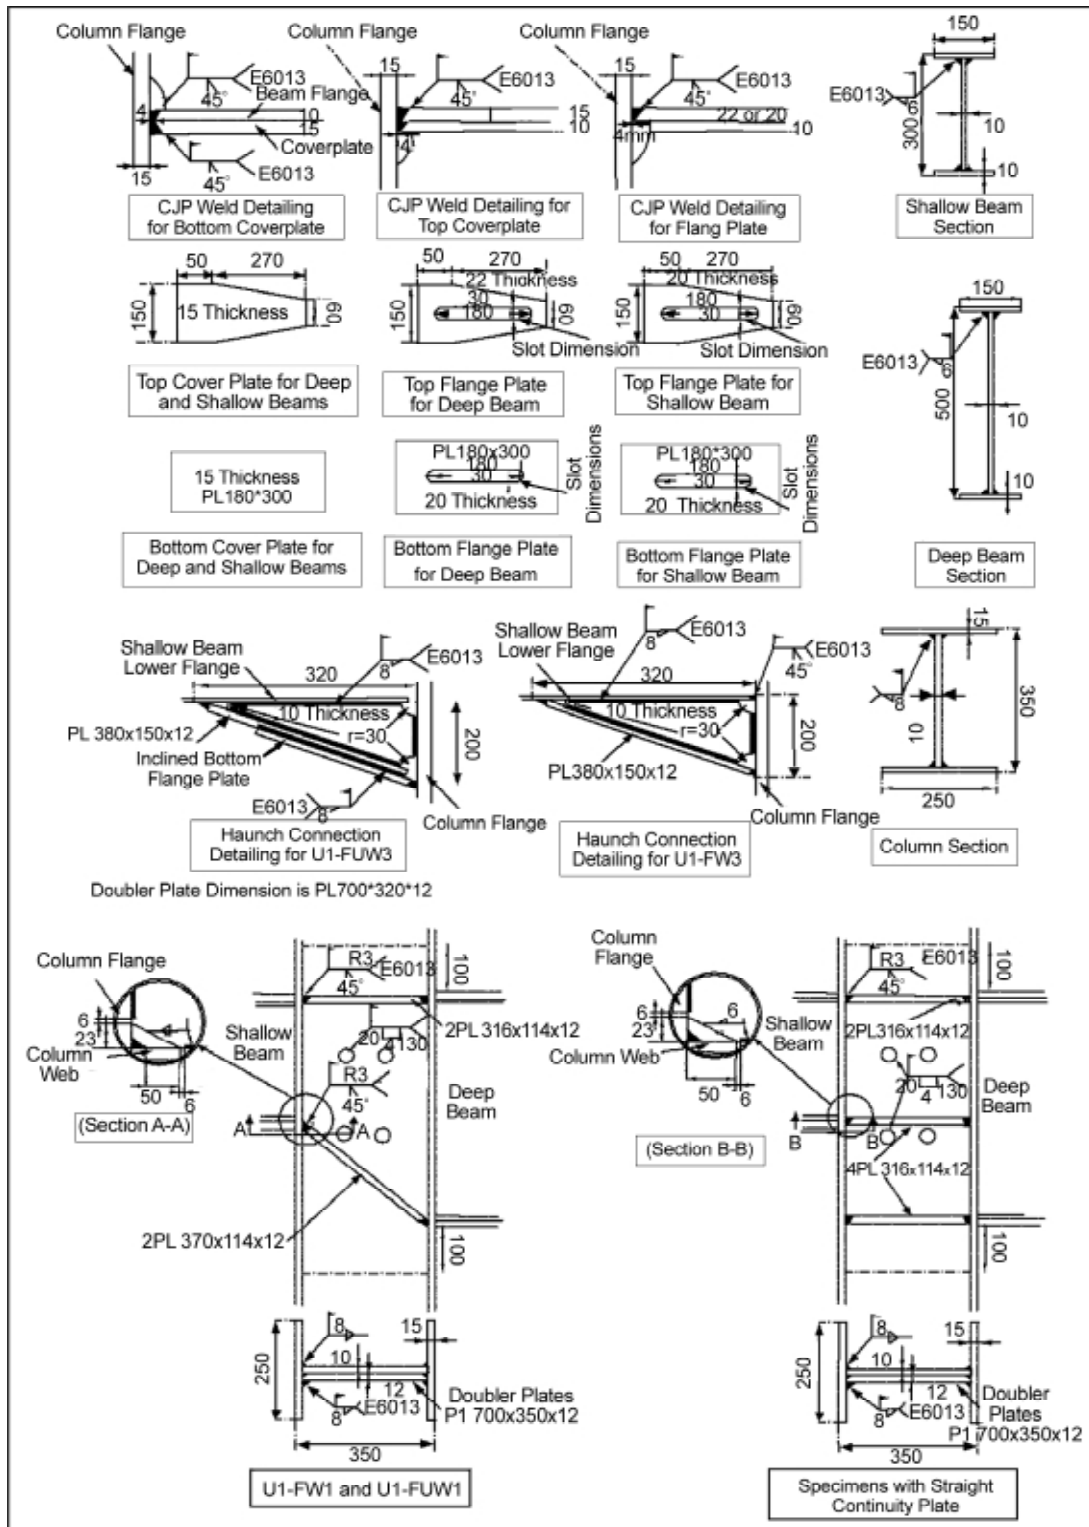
Section details of the test specimens (The dimensions are in millimeter).
